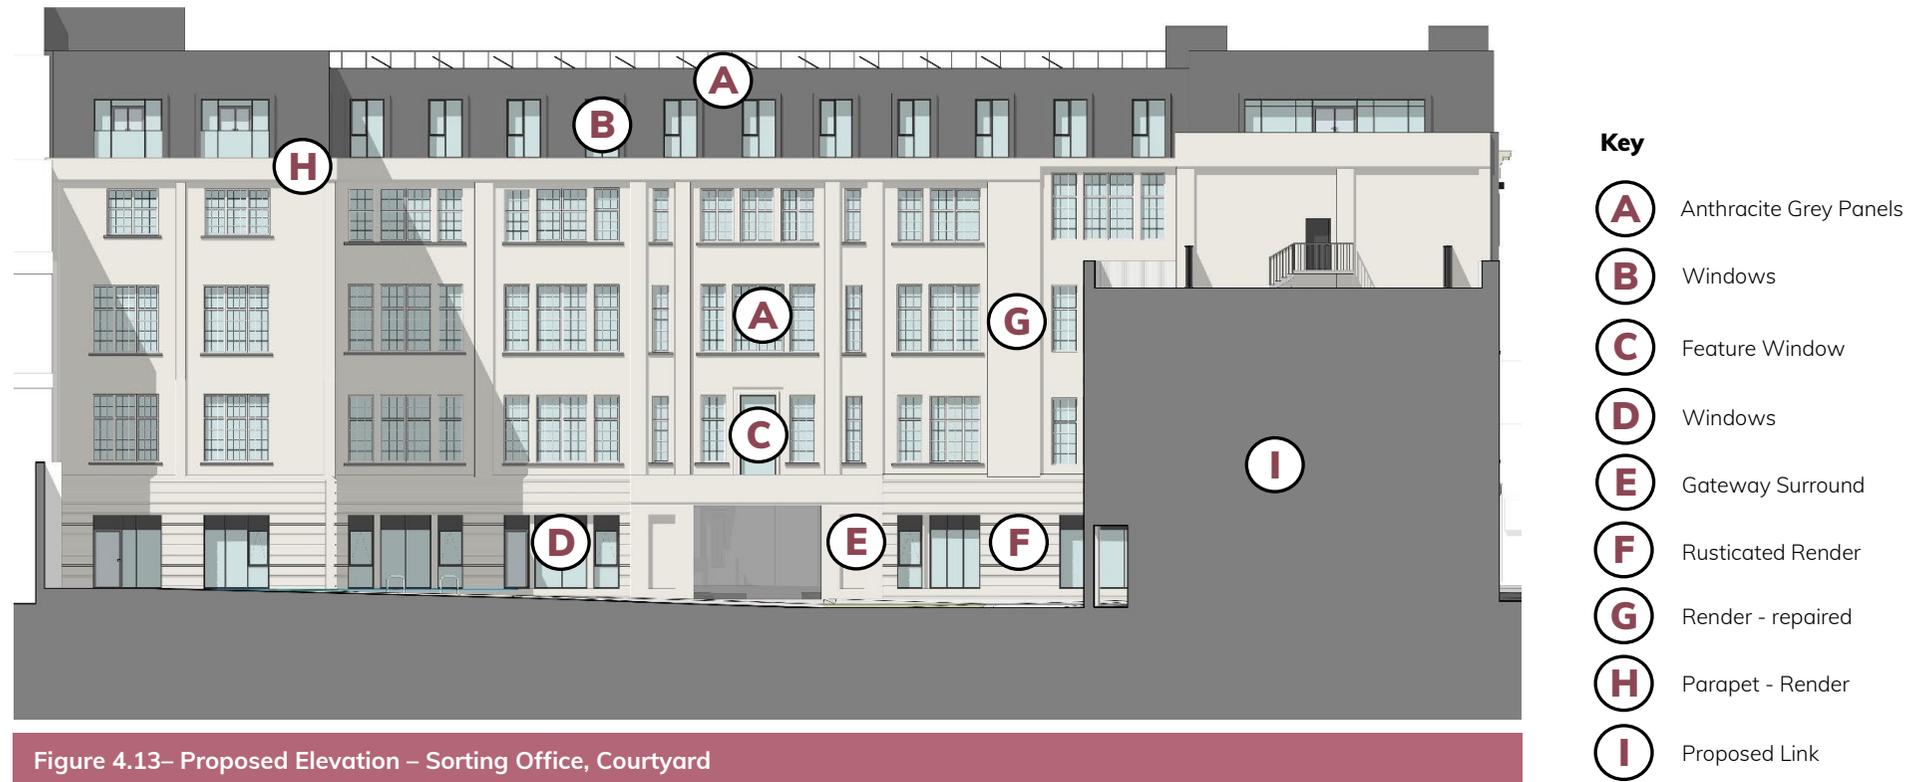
Proposed Elevation – Sorting Office, Courtyard
